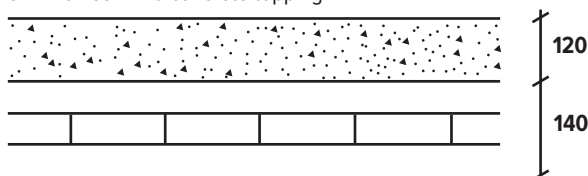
CLT SLAB DIMENSION EXAMPLES
